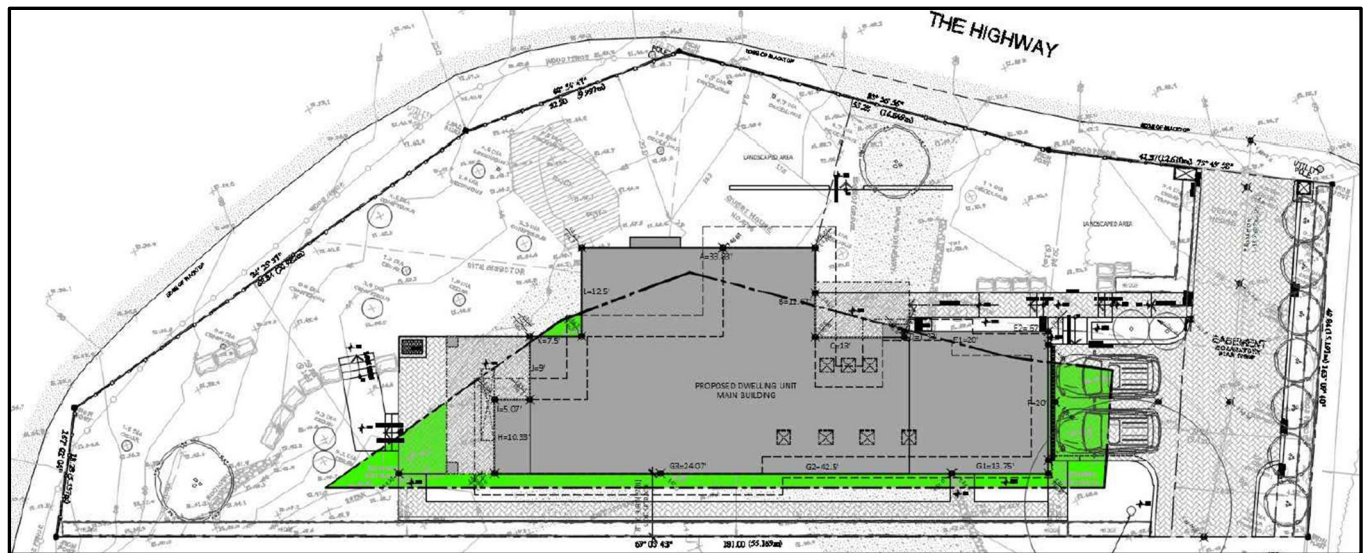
Site plan of Previous Proposal (showing front yard setback variances required and unused building envelope)
